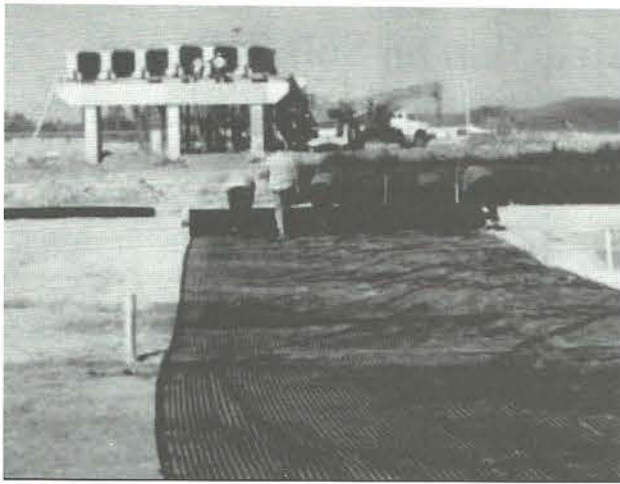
Example of simultaneous bridge and abutment constructions (Fahel, 2003).
